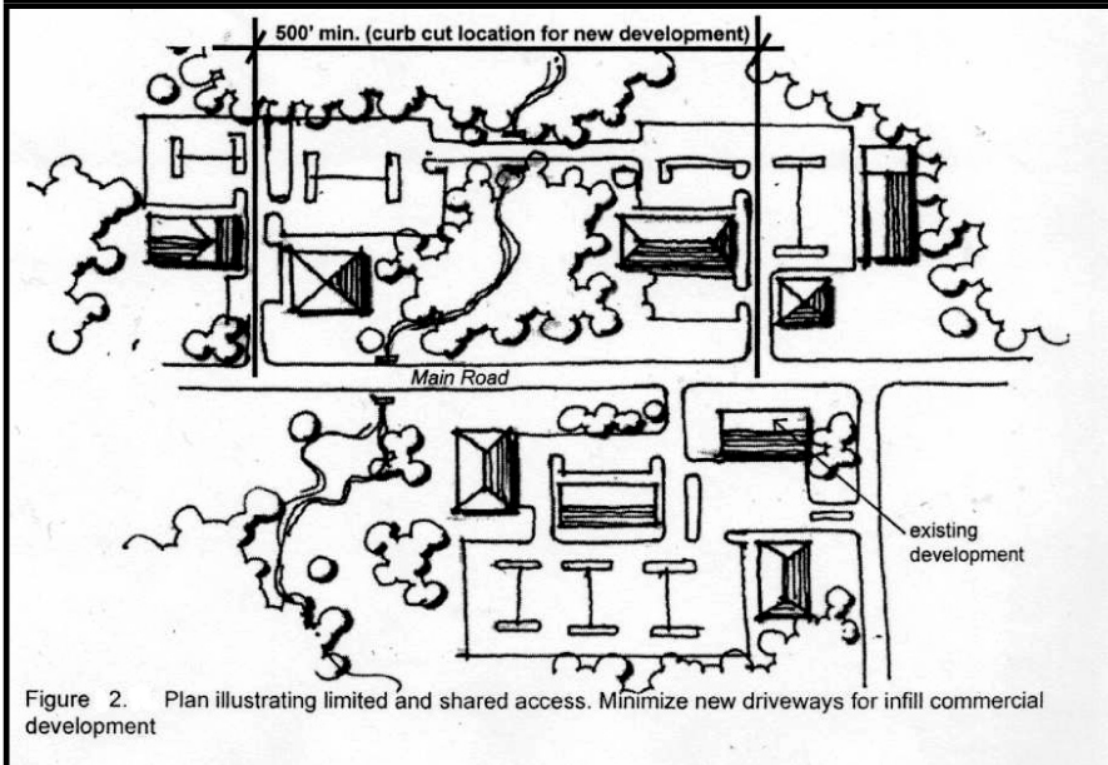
Plan illustrating limited and shared access. Minimize new driveways for infill commercial development
